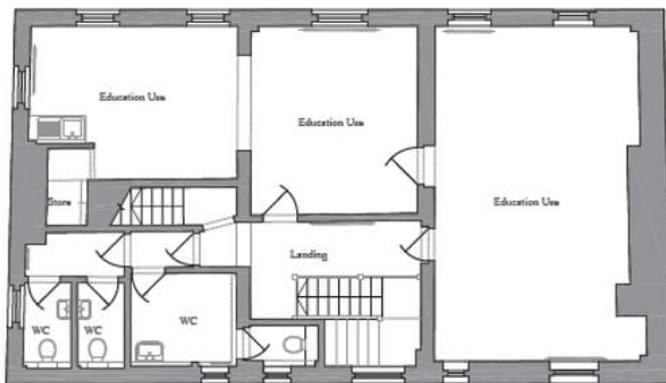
Option 2 - Proposed First and Second Floor (Class F1)
